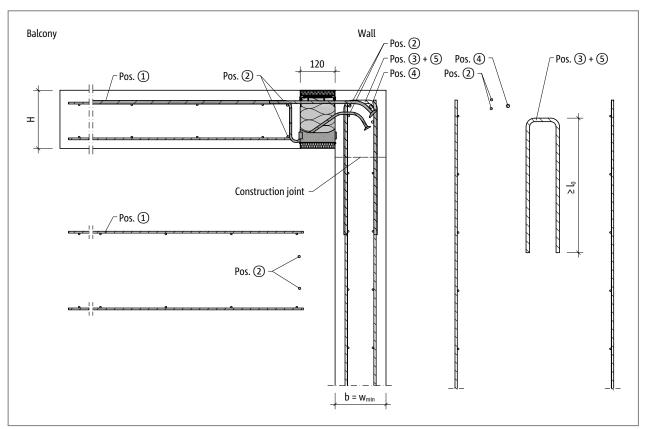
Schöck Isokorb® XT type K-O: On-site reinforcement for wall connection upwards with minimum structural element dimension (wvorh = wmin)
